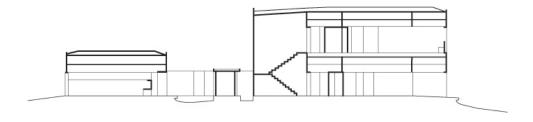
Section showing the main double story portion of the house through the stairs and the servant quarters in back.
